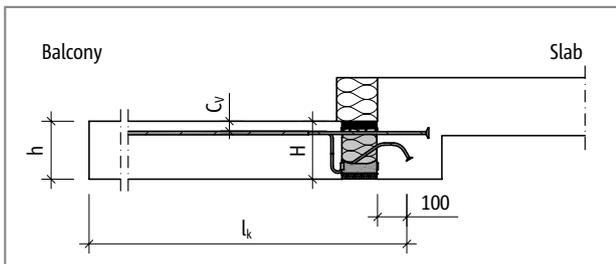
Schöck Isokorb® XT type K-U: Static system
